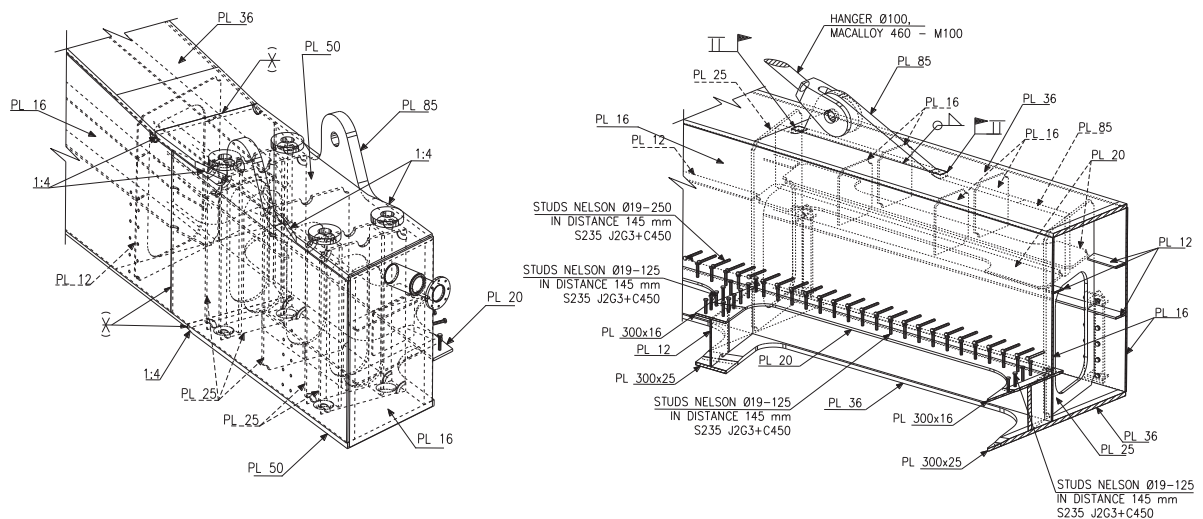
(a) the end of main girder at the shorter span; (b) the section of main girder at the longer span with the starters of crossbeams
